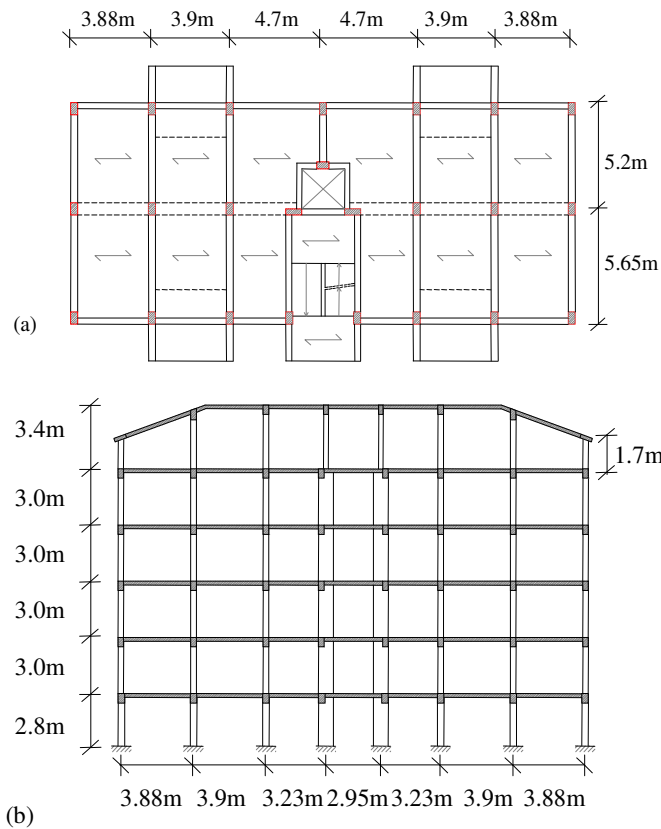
Planar view (a) and longitudinal section (b) of the bare building
